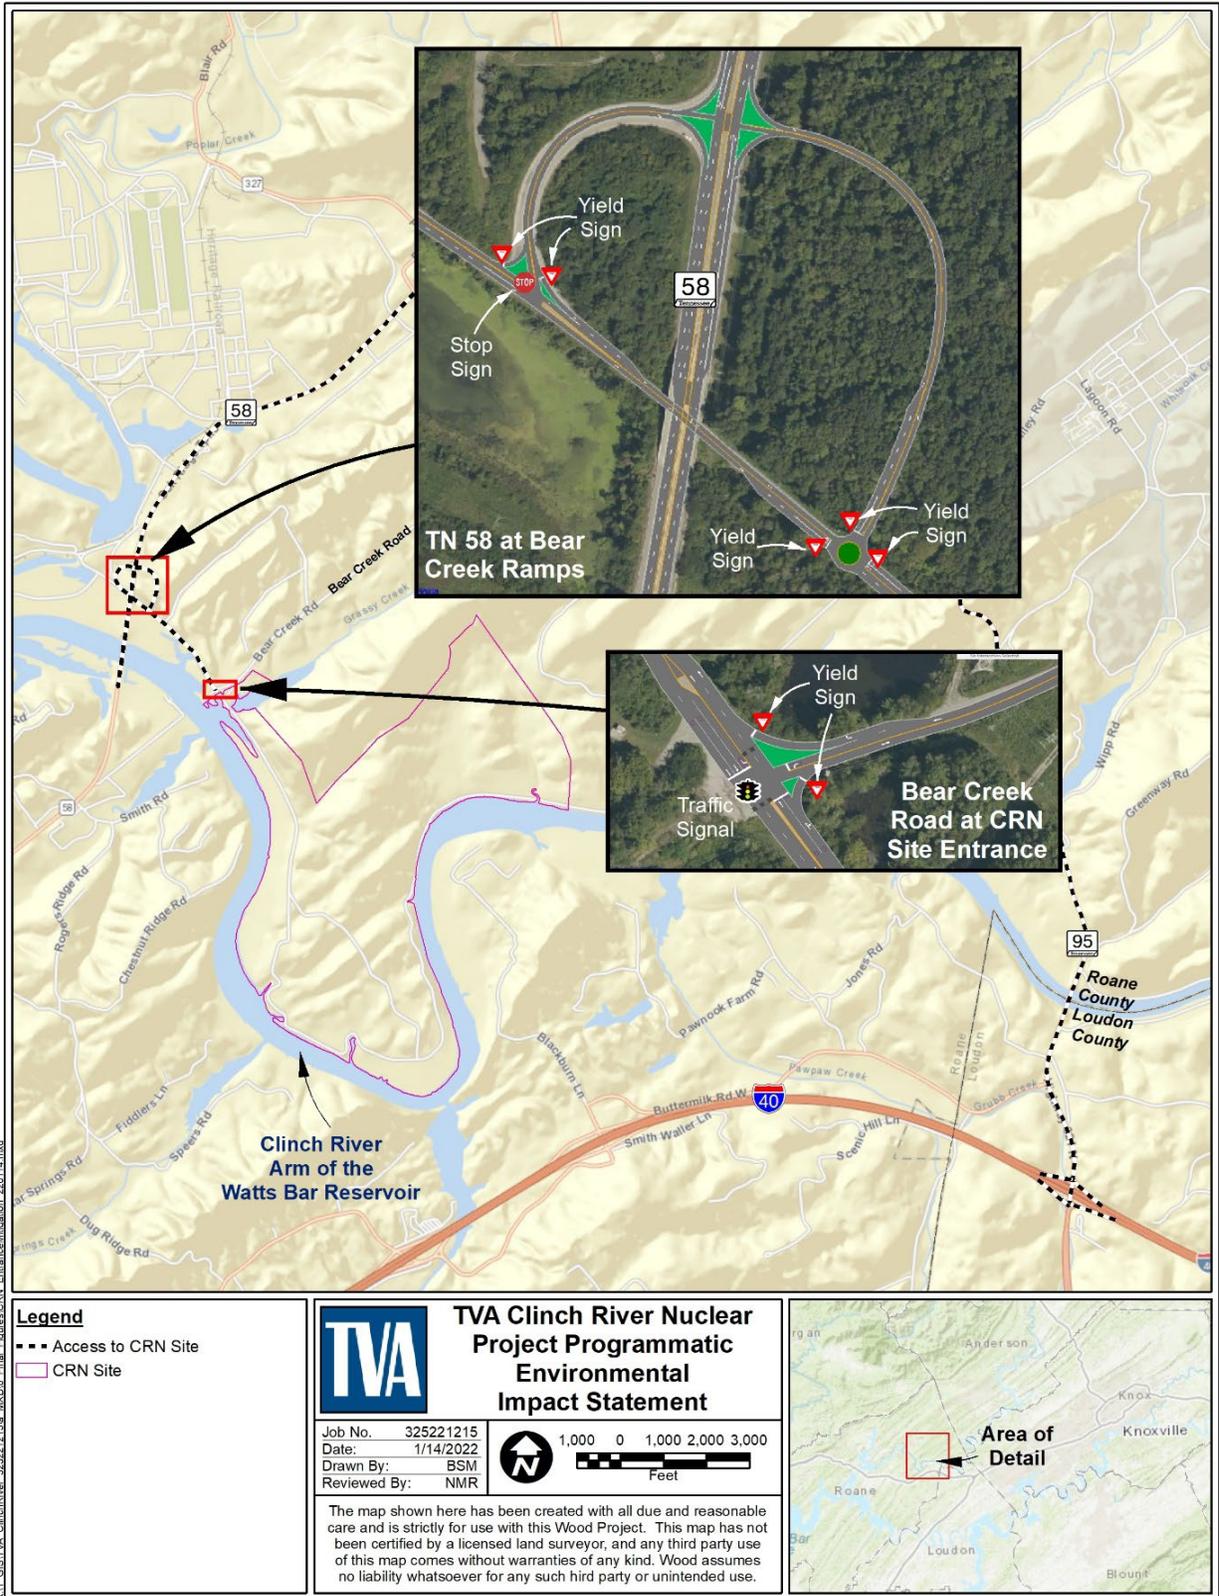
Proposed TN 58 and Bear Creek Road Improvements
